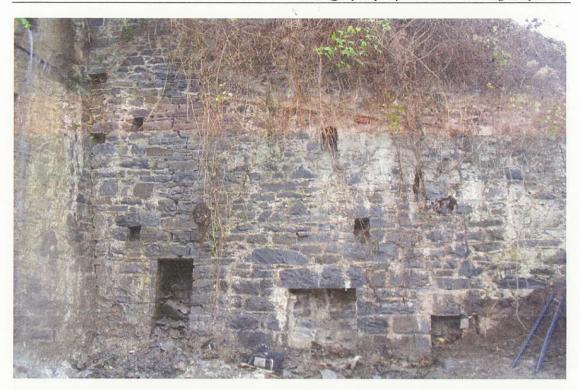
The north revetment wall of slipway showing the various features in the wall and the roof line scar. View NW
